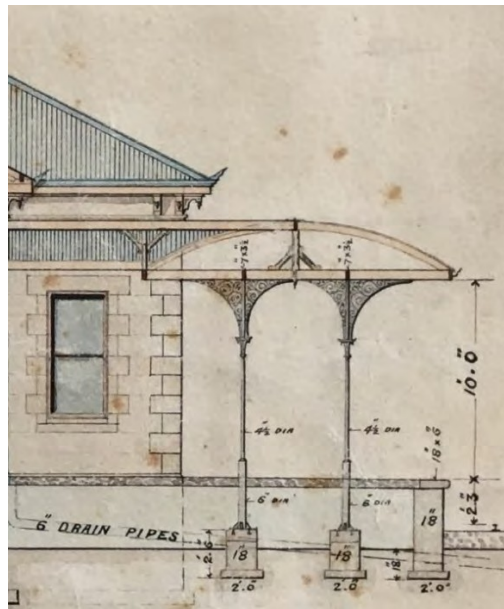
Original 1886 platform awning with curved roof. extract from drawing dated 25.5.1886. Source: QSA Series 17692 Plans of Queensland Railway Station Buildings etc., Item ID 120966.
